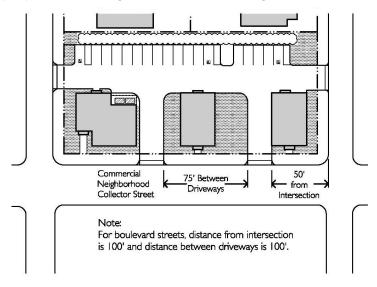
C.3.a Driveway Separation for Boulevards, Avenues, and Collectors
